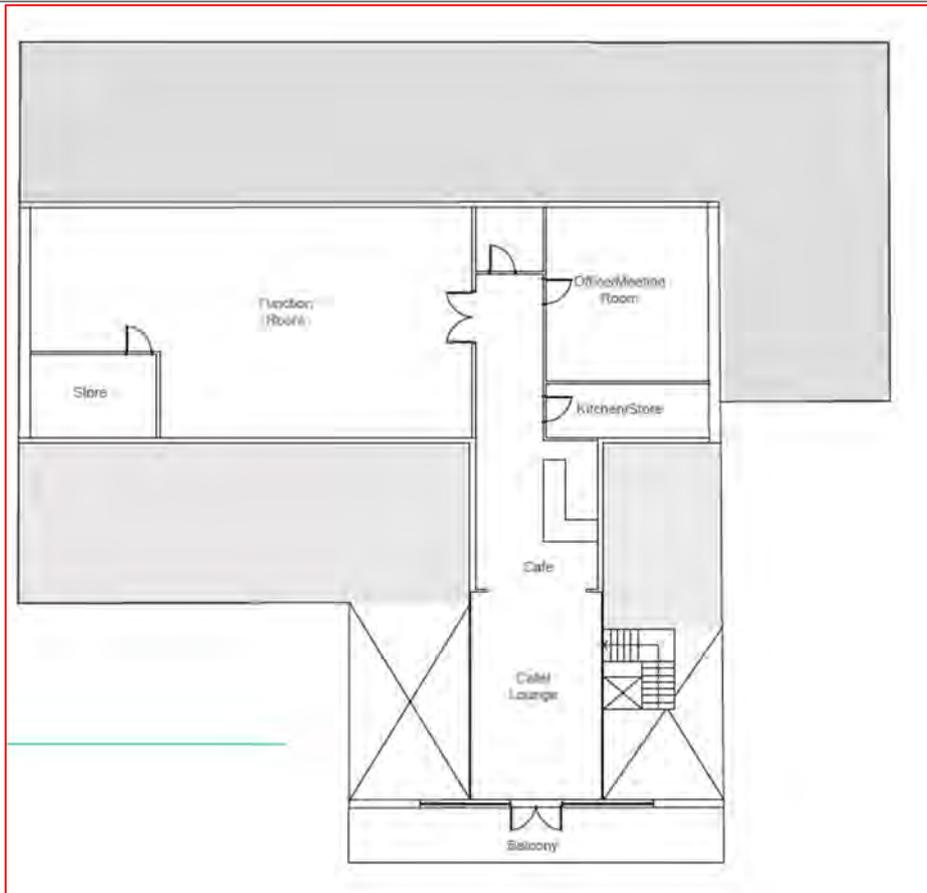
Option 2 Community Hall Proposed First Floor Plan
